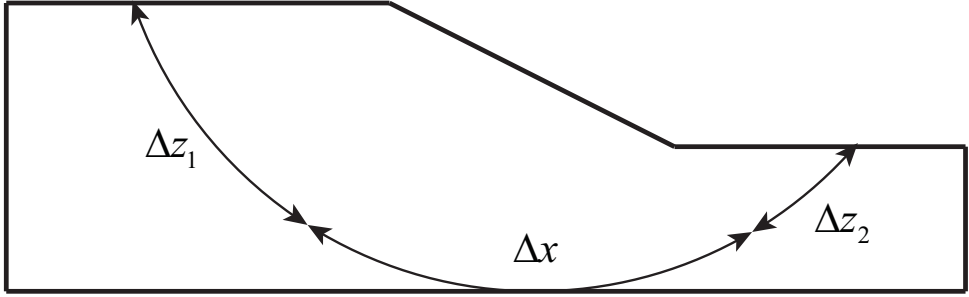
Subdivision of the failure arc for a slope with a foundation layer
